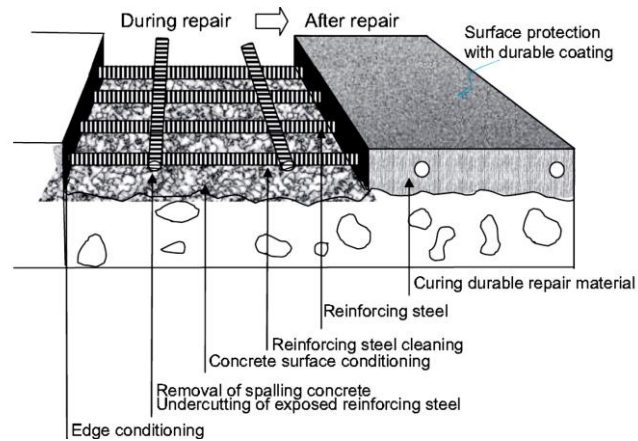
Repair of deteriorating concrete (delamination, spalling, and steel corrosion) [12].
